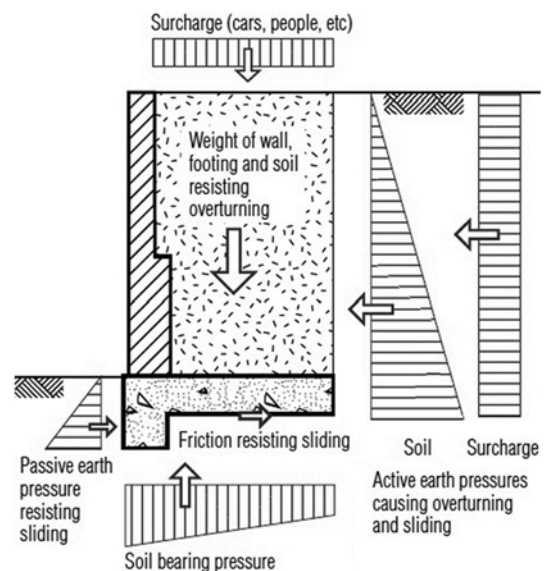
A Schematic View of a Cantilever Retaining Wall
